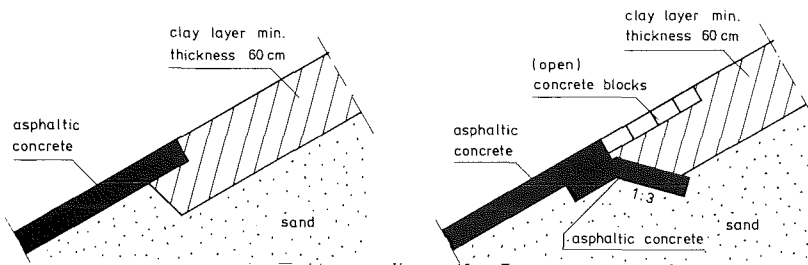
Examples of joints between asphaltic concrete and clay.
